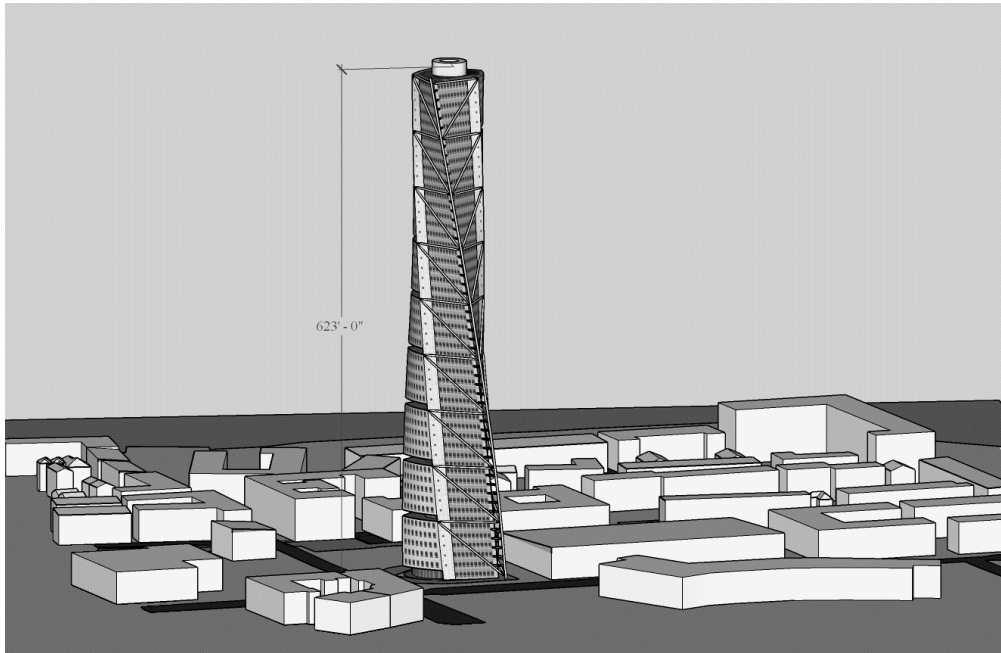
Turning Torso Tower Floor Plan & Structure Drawing, drawn by author.
